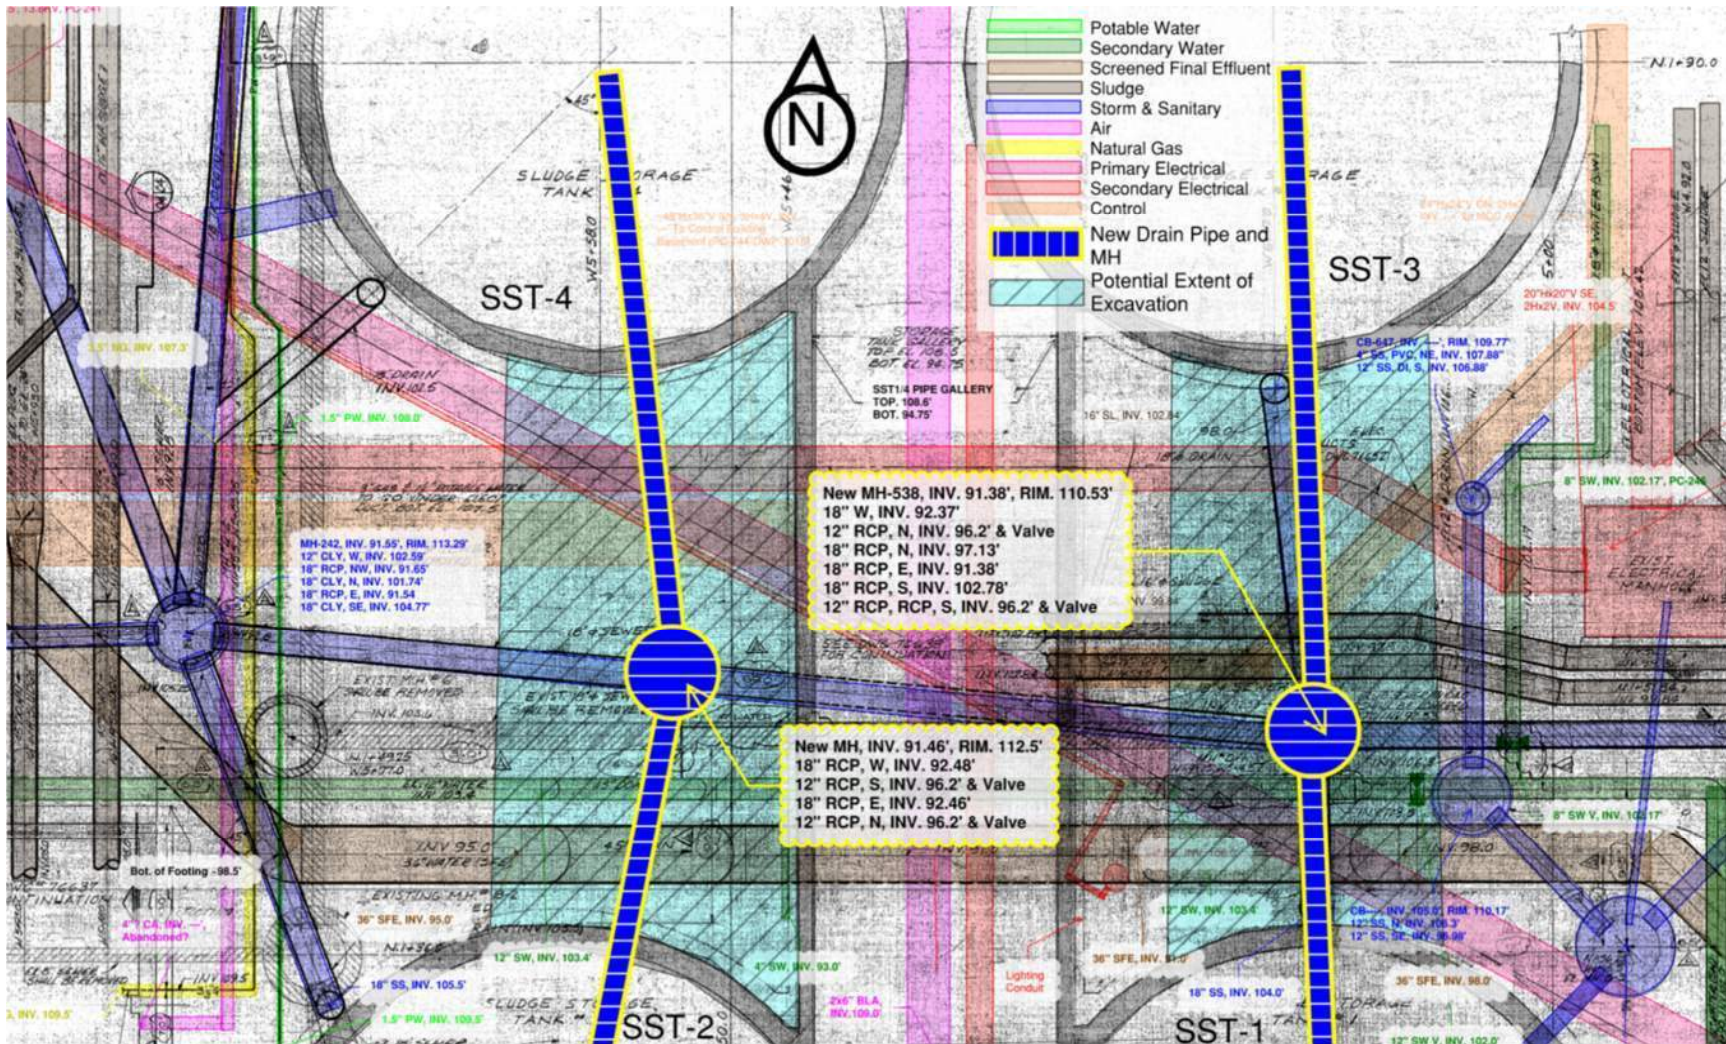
Alt-A2 Proposed Drain Pipe Routing and Interferences
